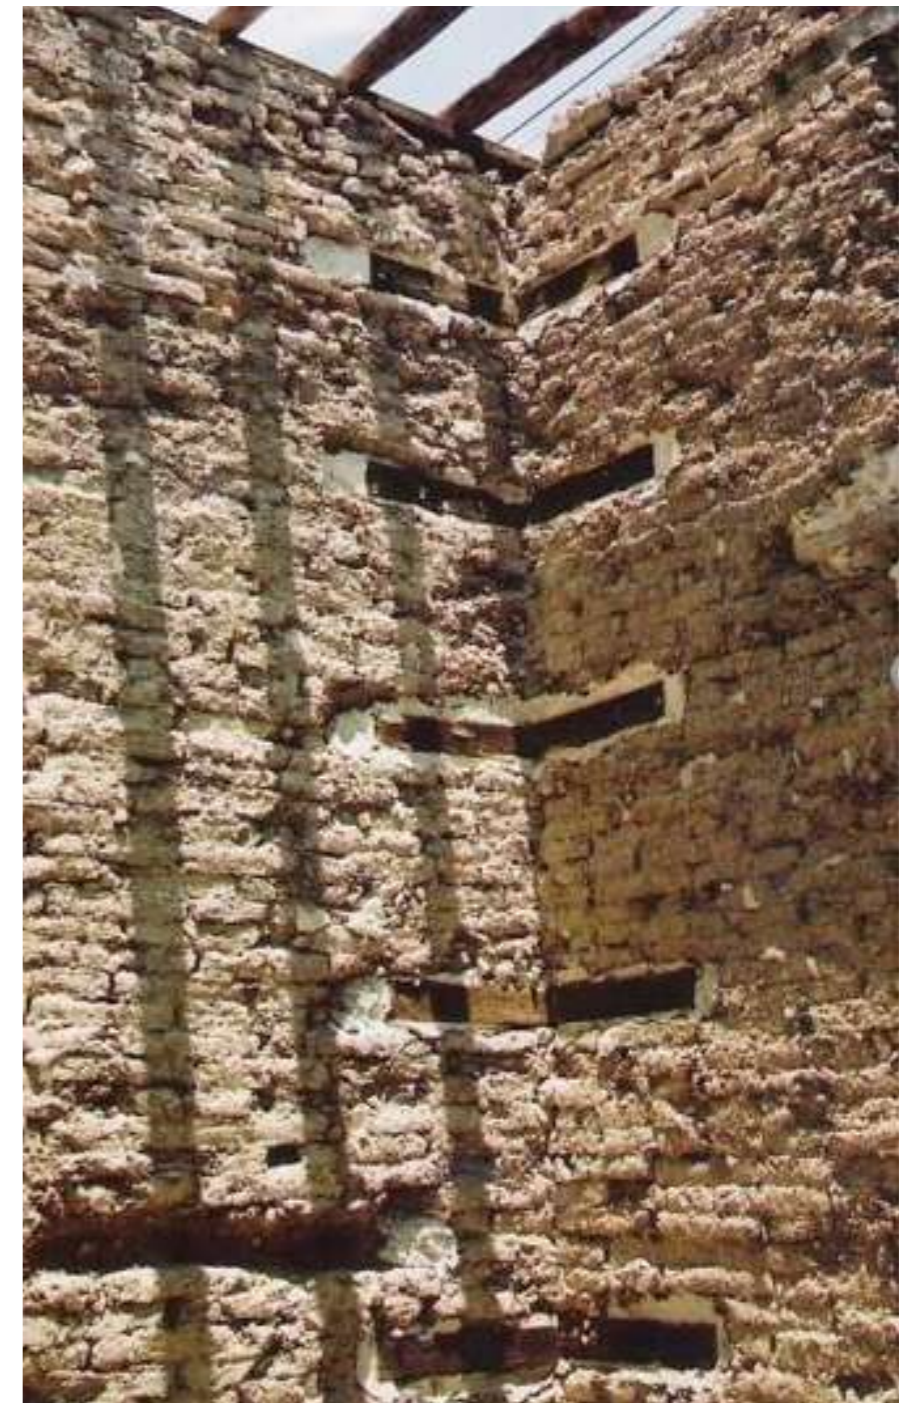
Restoration work of the central double space room and reinforcement of the adobe walls with the use of timber elements.
